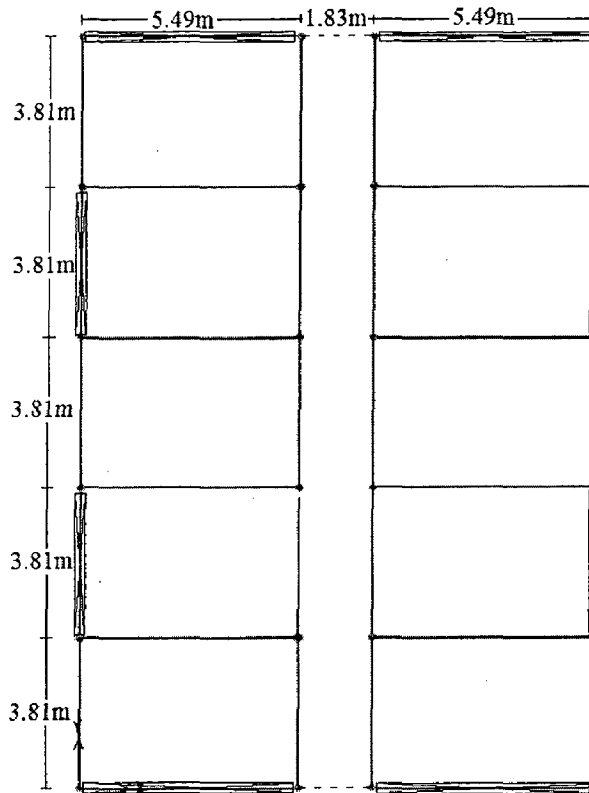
Shear link braced frame arrangement in Bldg-2
